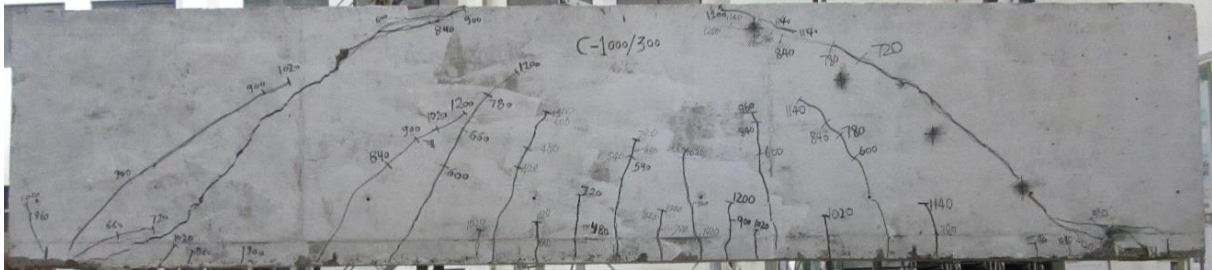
Control beam crack pattern (C-1000/300)
